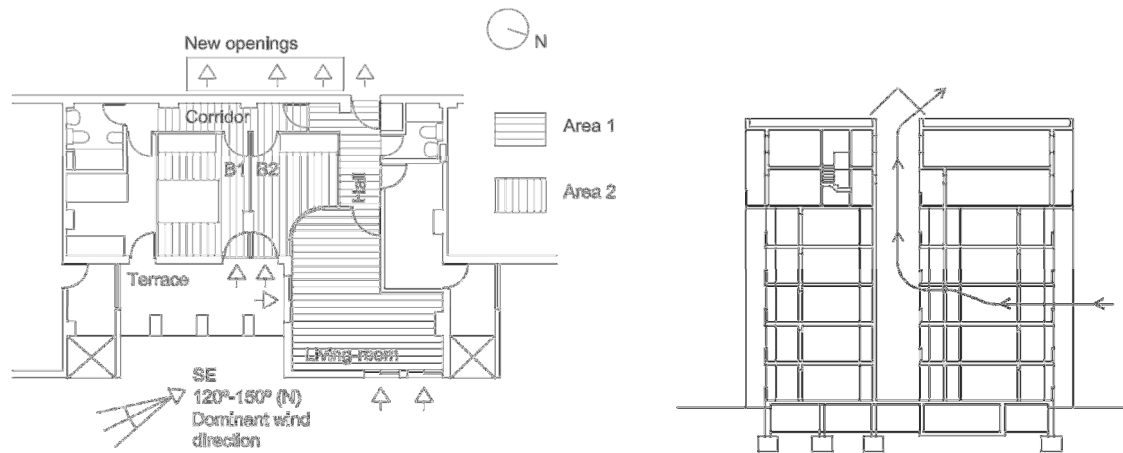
Floor plan of housing type A with Areas 1 and 2 (left). Cross section of the building (right).
